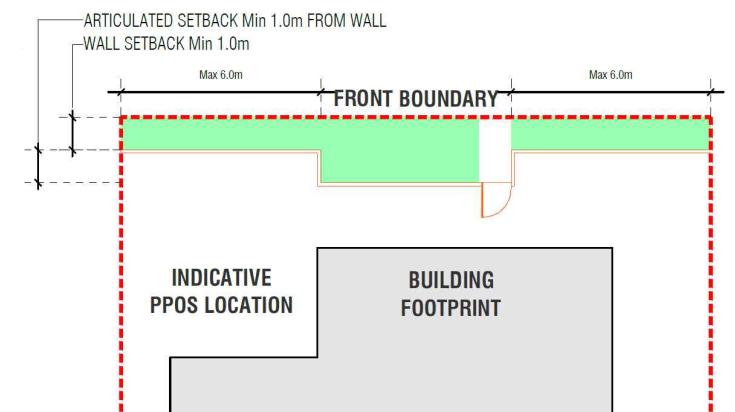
EXAMPLE - COURTYARD WALL, SHOWING A HOME FRONTING OPEN SPACE, WITH AN ARTICULATED GATE ENTRY AND PLANTING ZONE.
